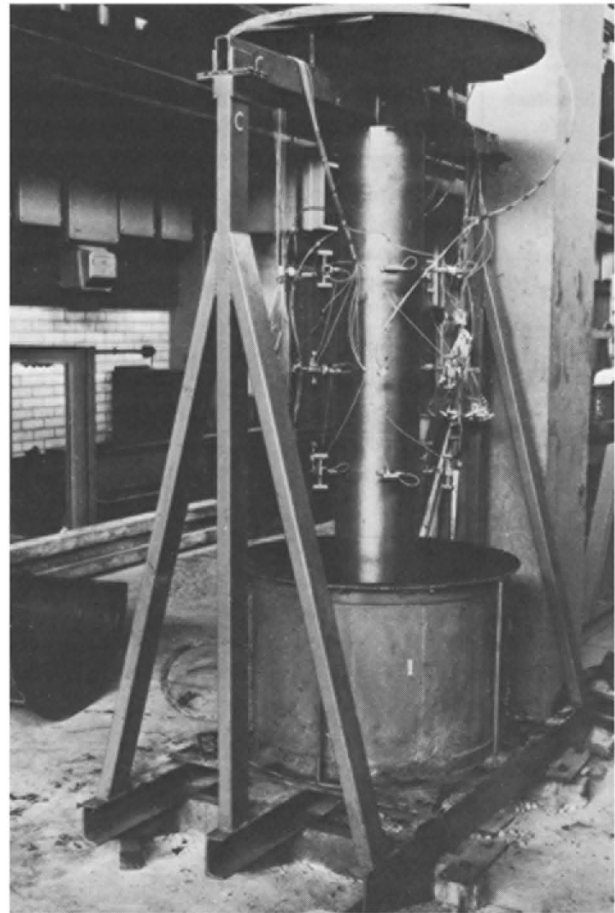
Specimen mould ready for casting, showing strain gauges in position.
